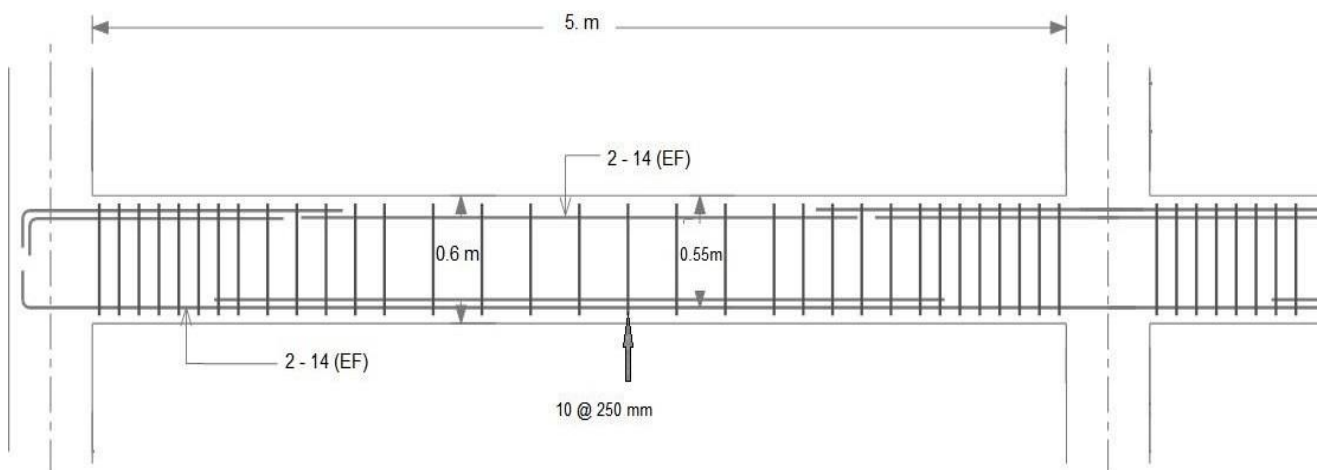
Reinforcement Detailing for Drop Beam (flat slab)
